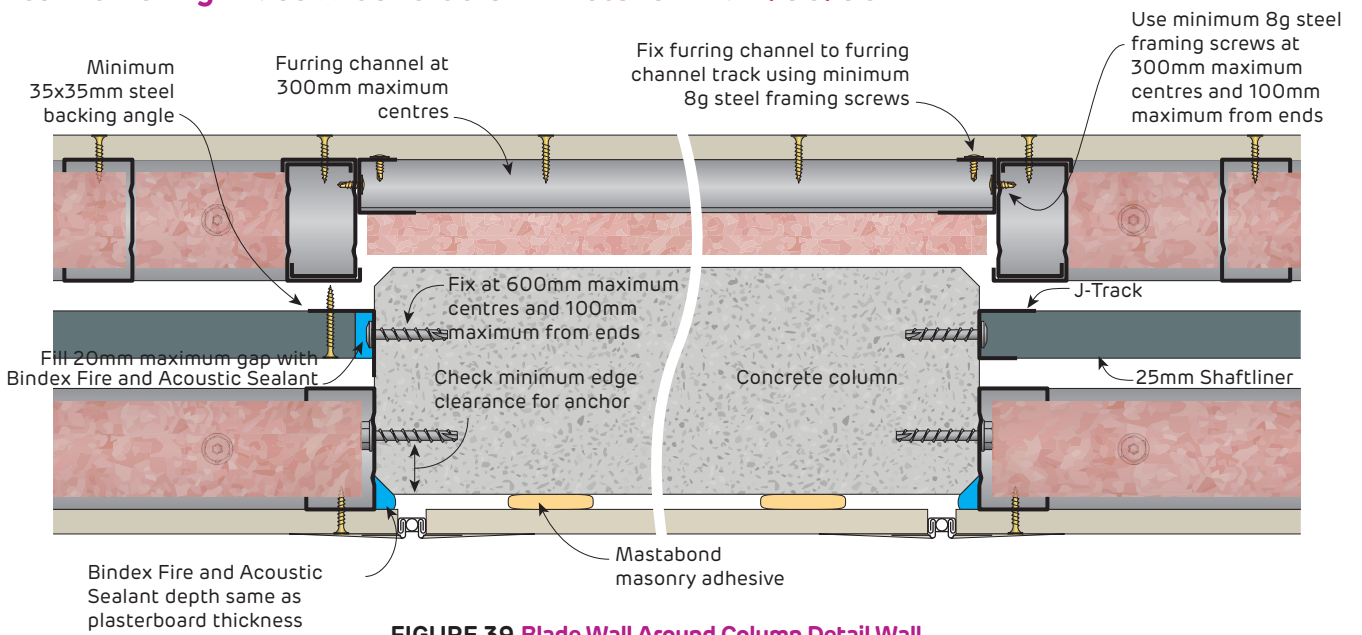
Blade Wall Around Column Detail Wall Plan
